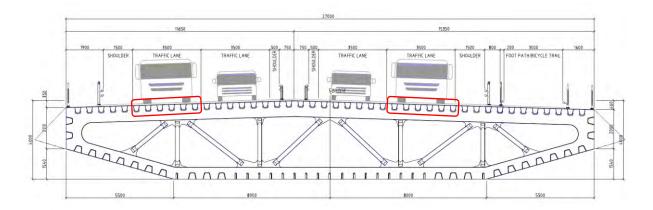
Areas of bridge girder deck with high fatigue utilization due to local traffic loads
